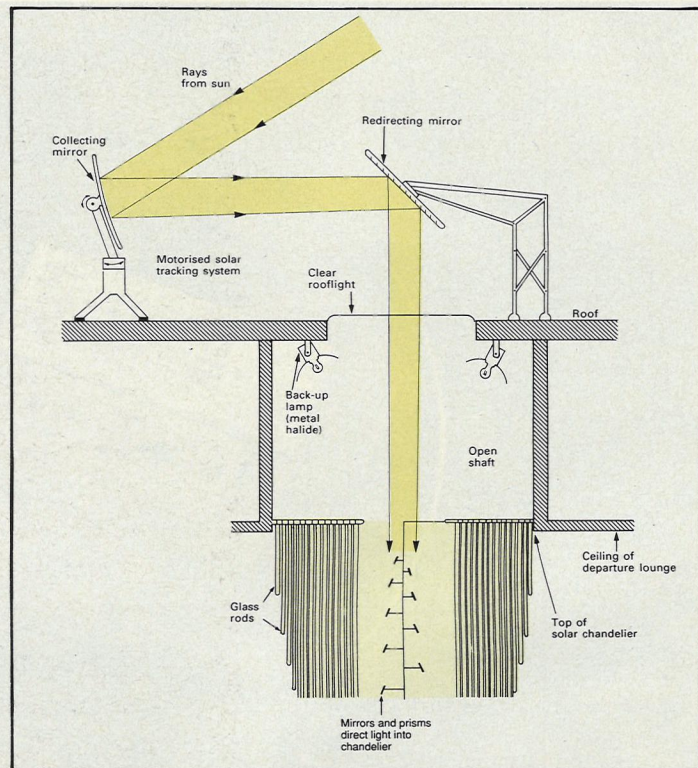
Piped sunlighting system at Manchester Airport: schematic cross-section
